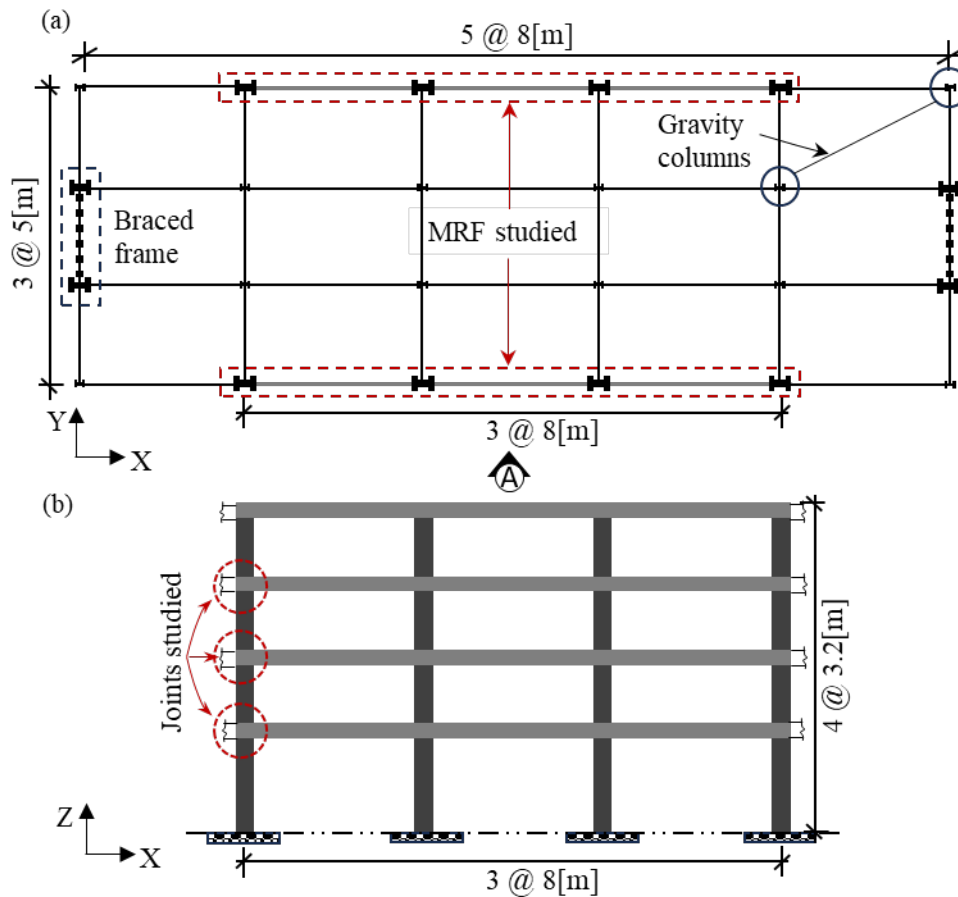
Prototype building: (a) Plan view; and (b) Elevation A.
